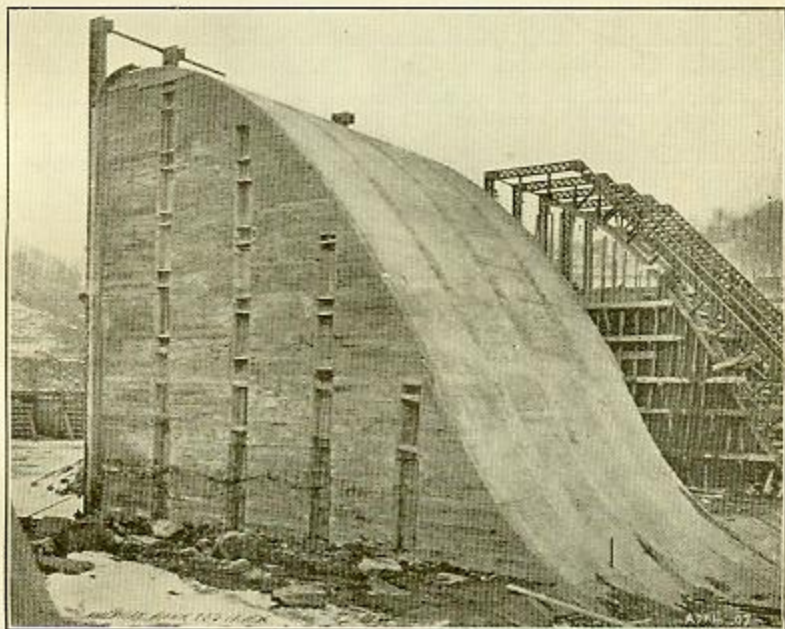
Section of Dam and Steel Forms, McCall Ferry Power Co.
